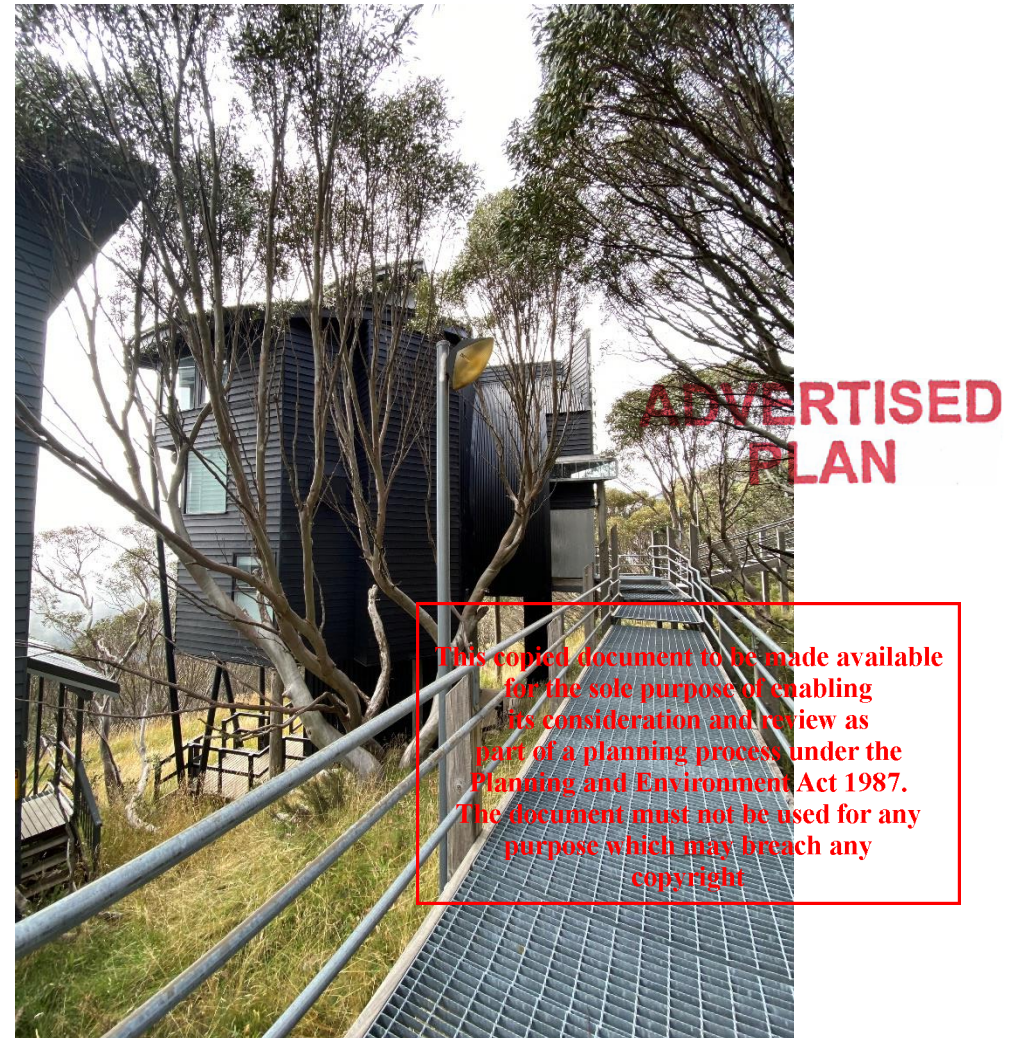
Common stairway taken in front of Lot 34 looking at the building on Lot 32 with Lot 31 in the background in the right hand corner
